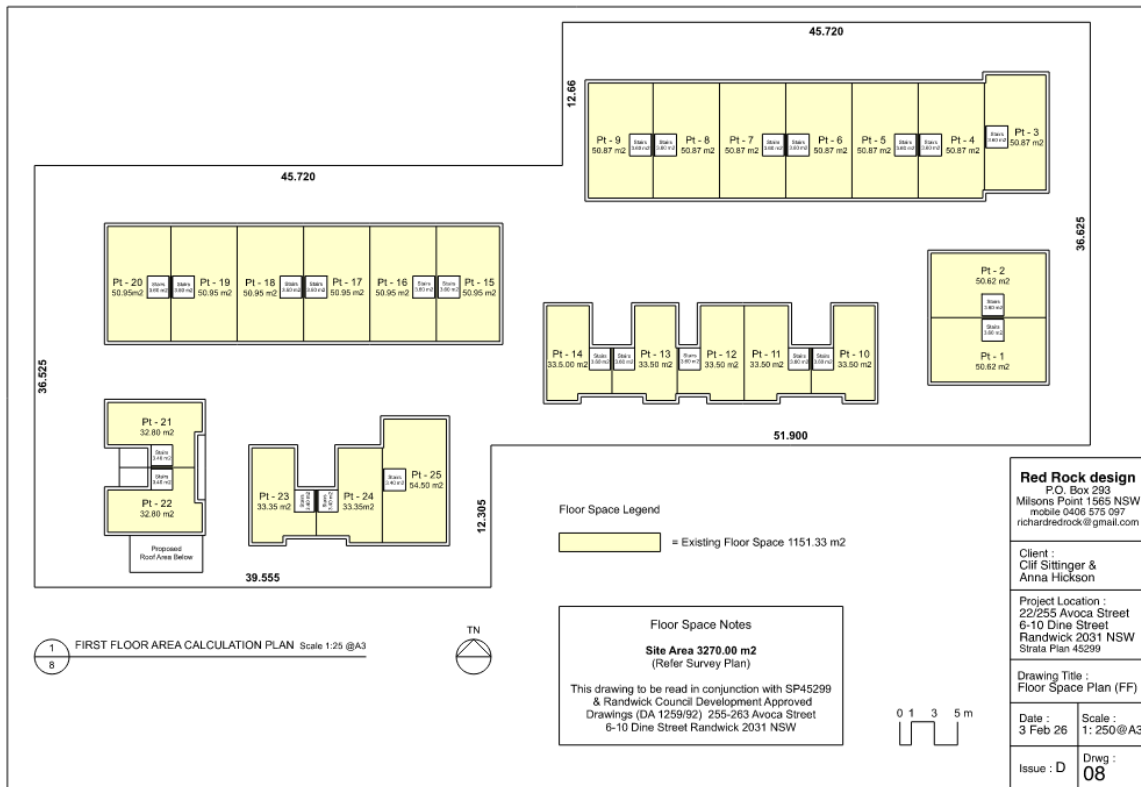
First floor Calculation Plan (Source: Red Rock Design).
